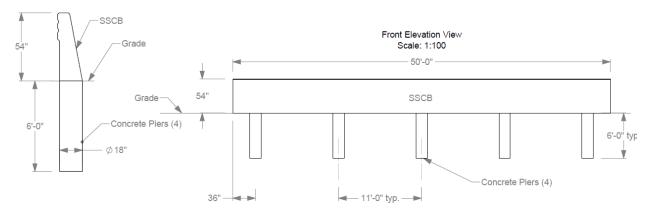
Drilled Shaft Foundation with Five 6-Ft Long Drilled Shafts.
